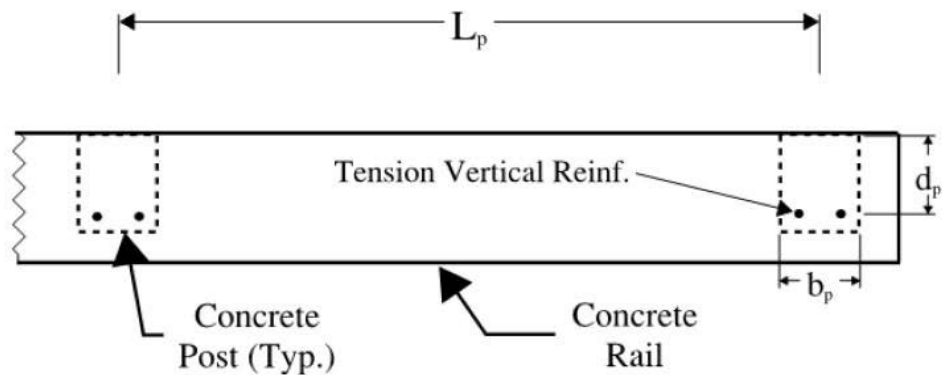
Plan View of a Concrete Post-and-Beam Railing showing Concrete Post Inputs
